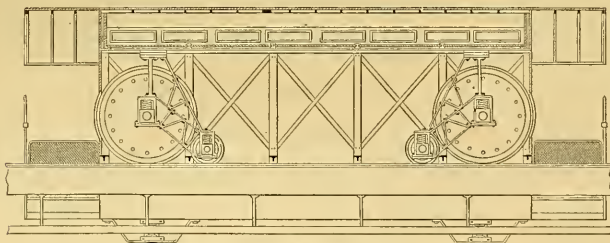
ADAMS' ELEVATED RAILWAY.
